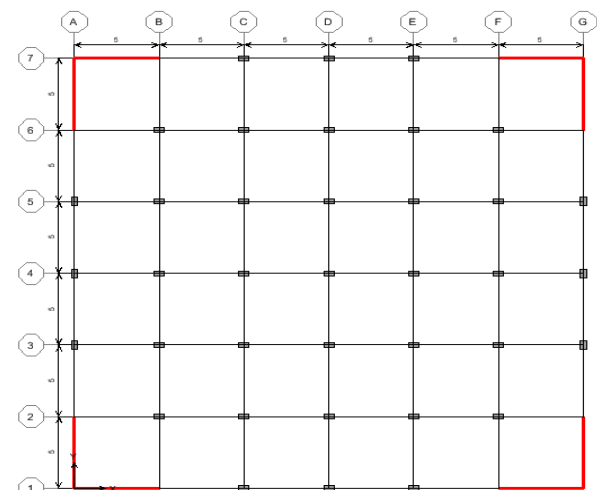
Model 2: Regular Building with Shear Wall at Position 1 (corners)
